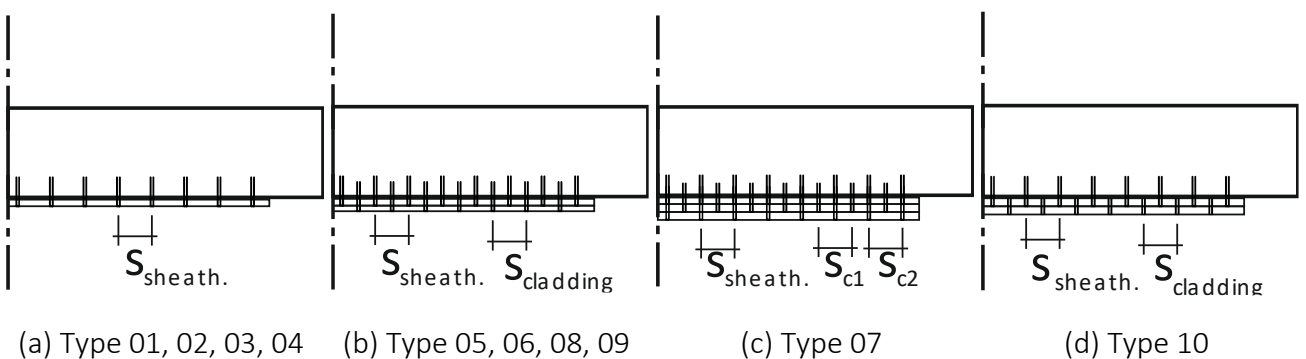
Fastener details in top rail of the test specimens with single-sided sheathing.
